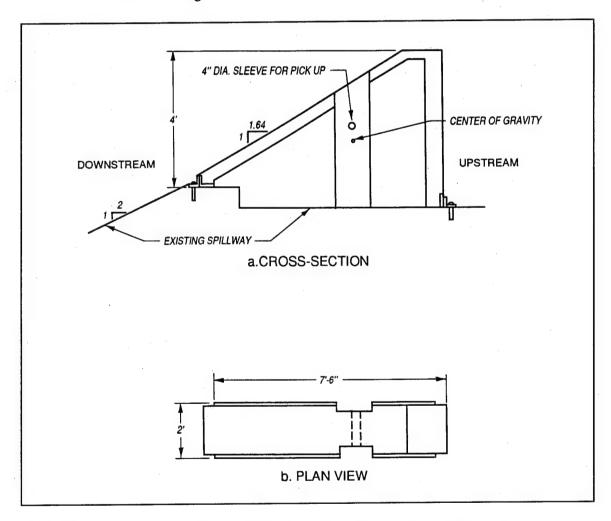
Precast concrete unit installed at Fellows Lake and Dam (after Rogers and Ruggeri 1992)
